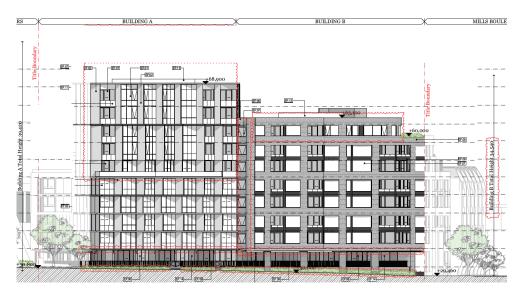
Recommended western elevation of Buildings A and B (reduced to 10 and 8 storeys)
